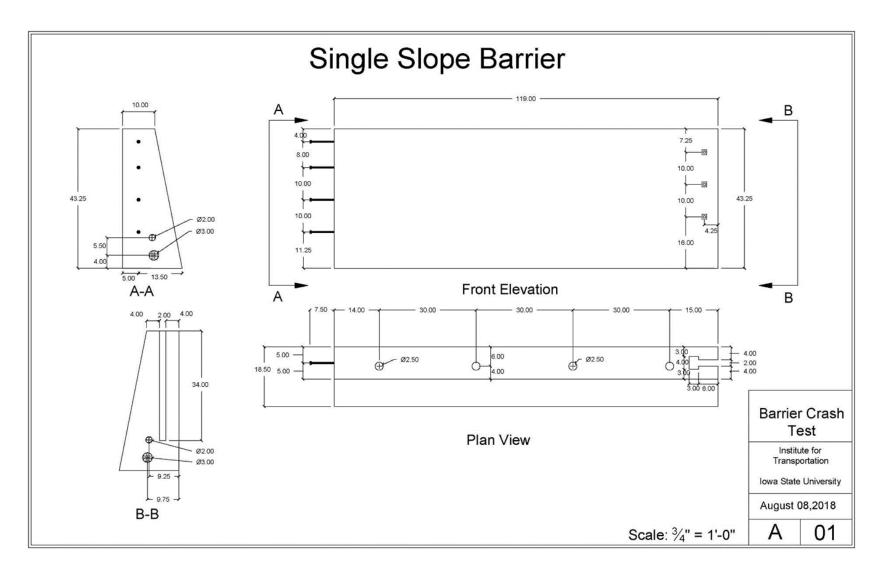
Single-Slope Barrier Segment, Dimensions in Inches [5]
